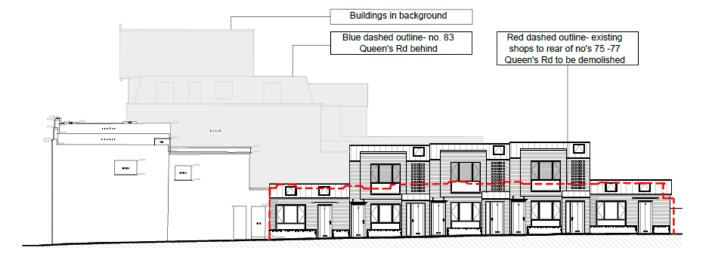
Proposed east side elevation fronting the access road (front of the flats)
